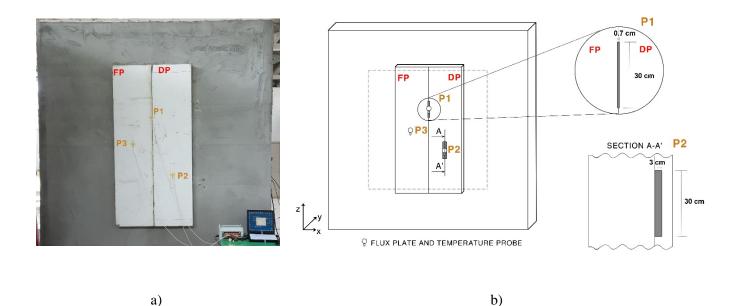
Setup and defects details: a) picture; b) drawing with sizes.
